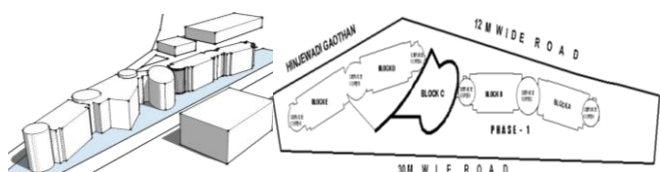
3D view & Plan of Persistent Building at Hinjewadi
